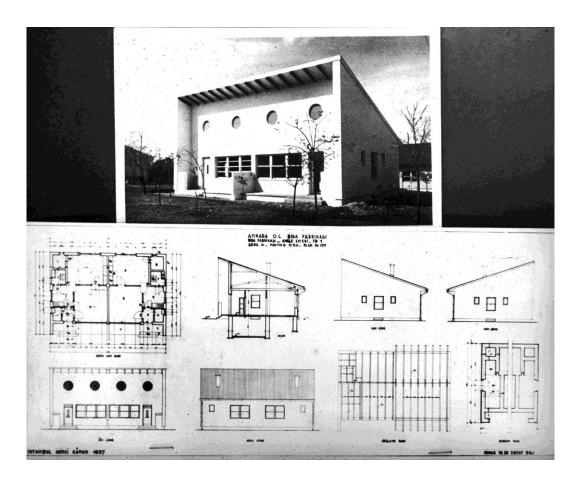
Original plans, section and elevations of dwellings. The final view after its construction is attached to the document, too. Reprinted with permission from ETH-Bibliothek, Zurich.
